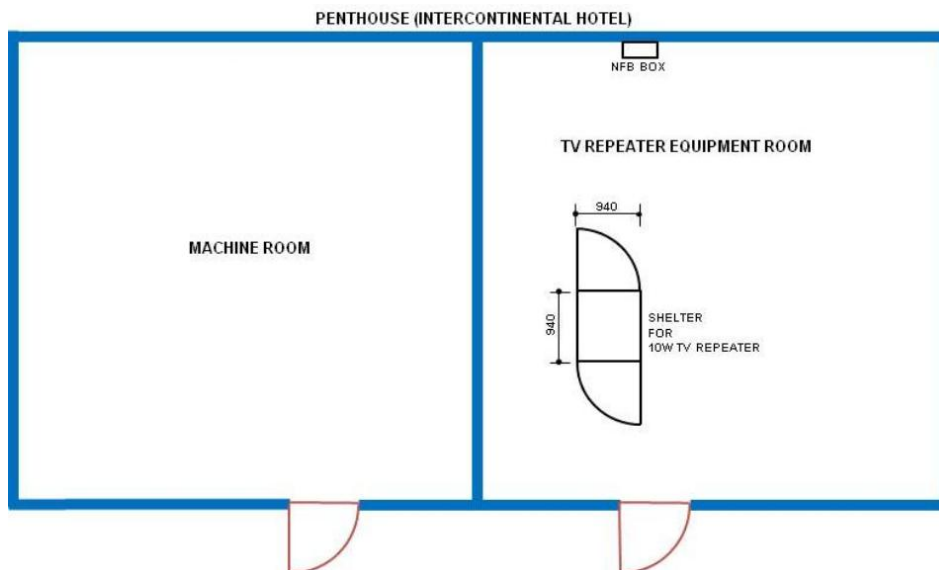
Equipment Arrangement of TV Repeater Equipment Room
